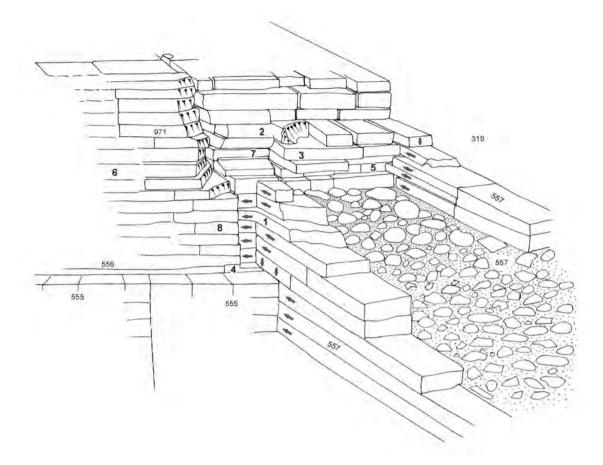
Sketch of the joint between walls 556 and 557 at the southwest corner of the North Temple from the south-west. Arrows indicate where a brick abuts another.
